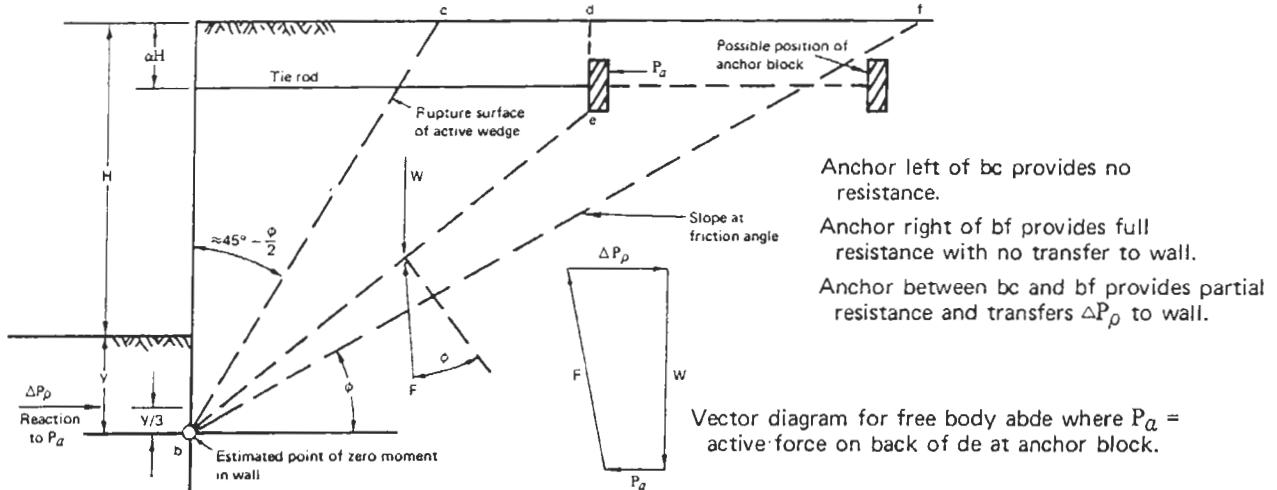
Effects of anchor location relative to the wall (after Navdocks¹¹, Terzaghi¹³)
